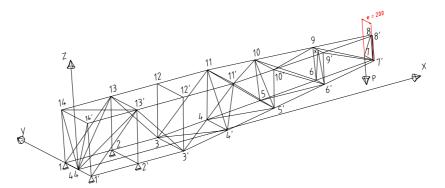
The test truss. Points 1, 1`, 2, 2` are fixed points, P – load force, e- an arm of the force
